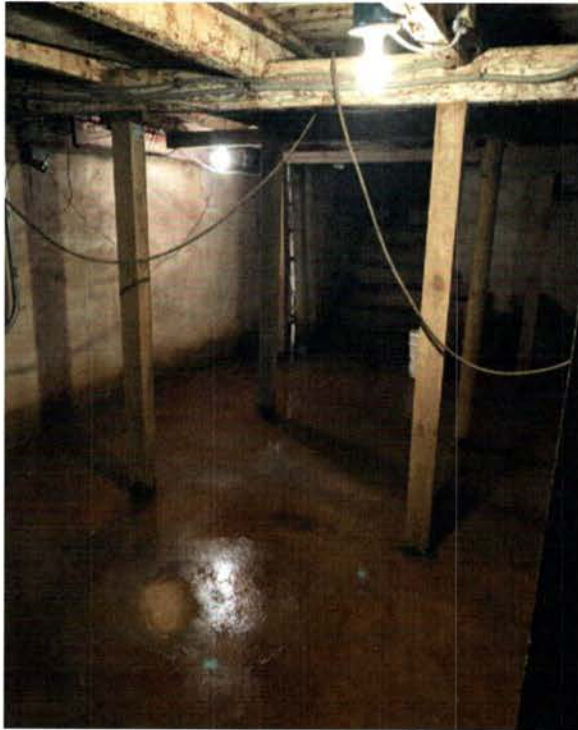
Cellar D (Room 007) at Build C below the Kitchen (Room 108). Two rows of intermediate beams and posts were installed to provide additional support to the original 1st floor framing. Persistent ground water is a problem particularly in this area. Sump pump #1 is in the background as well as steps leading up to an areaway.
